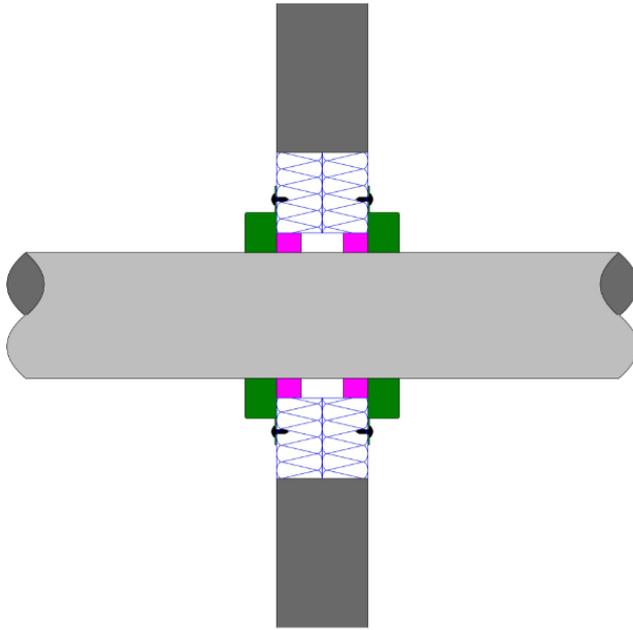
Typical installation of pipes fitted in two layers of BOSS Batt friction fitted to wall aperture and BOSS MaxiCollar™ installed on both faces
